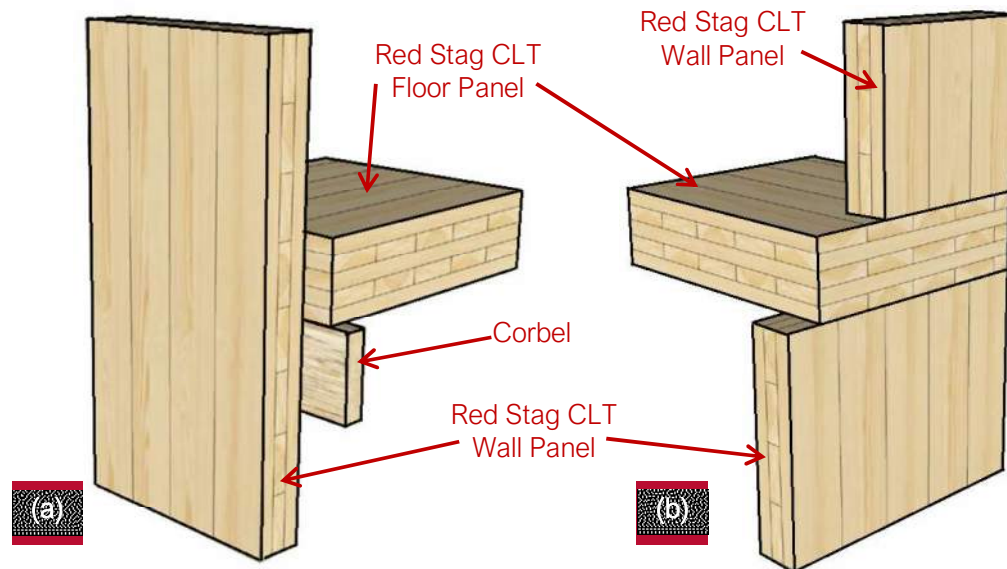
Assembly techniques; (a) CLT balloon construction system; (b) CLT platform construction system.
